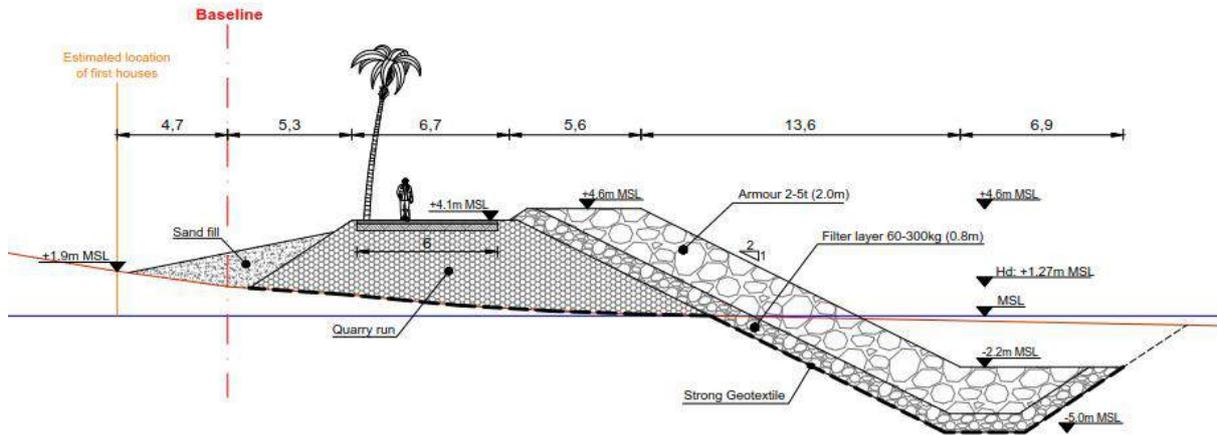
Principle cross-section Revetment New Kru Town – without existing structure – Chainage 850
